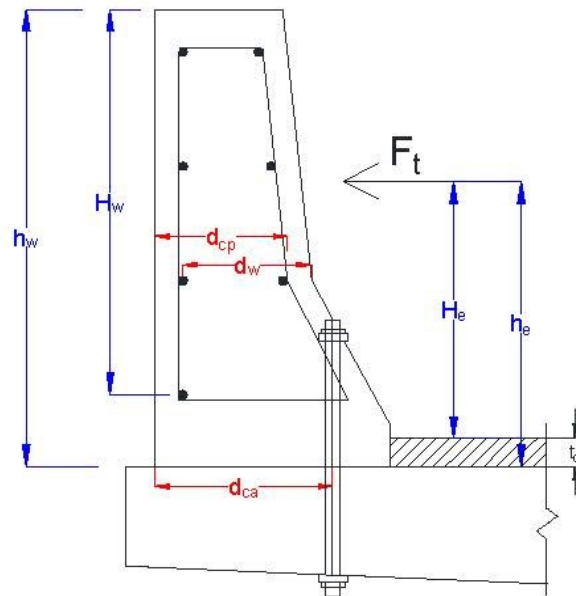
Sketch of Concrete Wall/Parapet Showing Input Variables
